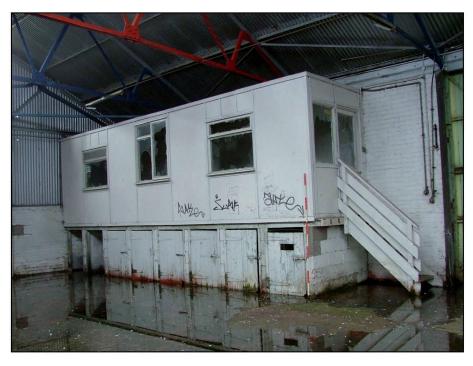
The north-east corner of the interior of Building E (Scale = 2m)
